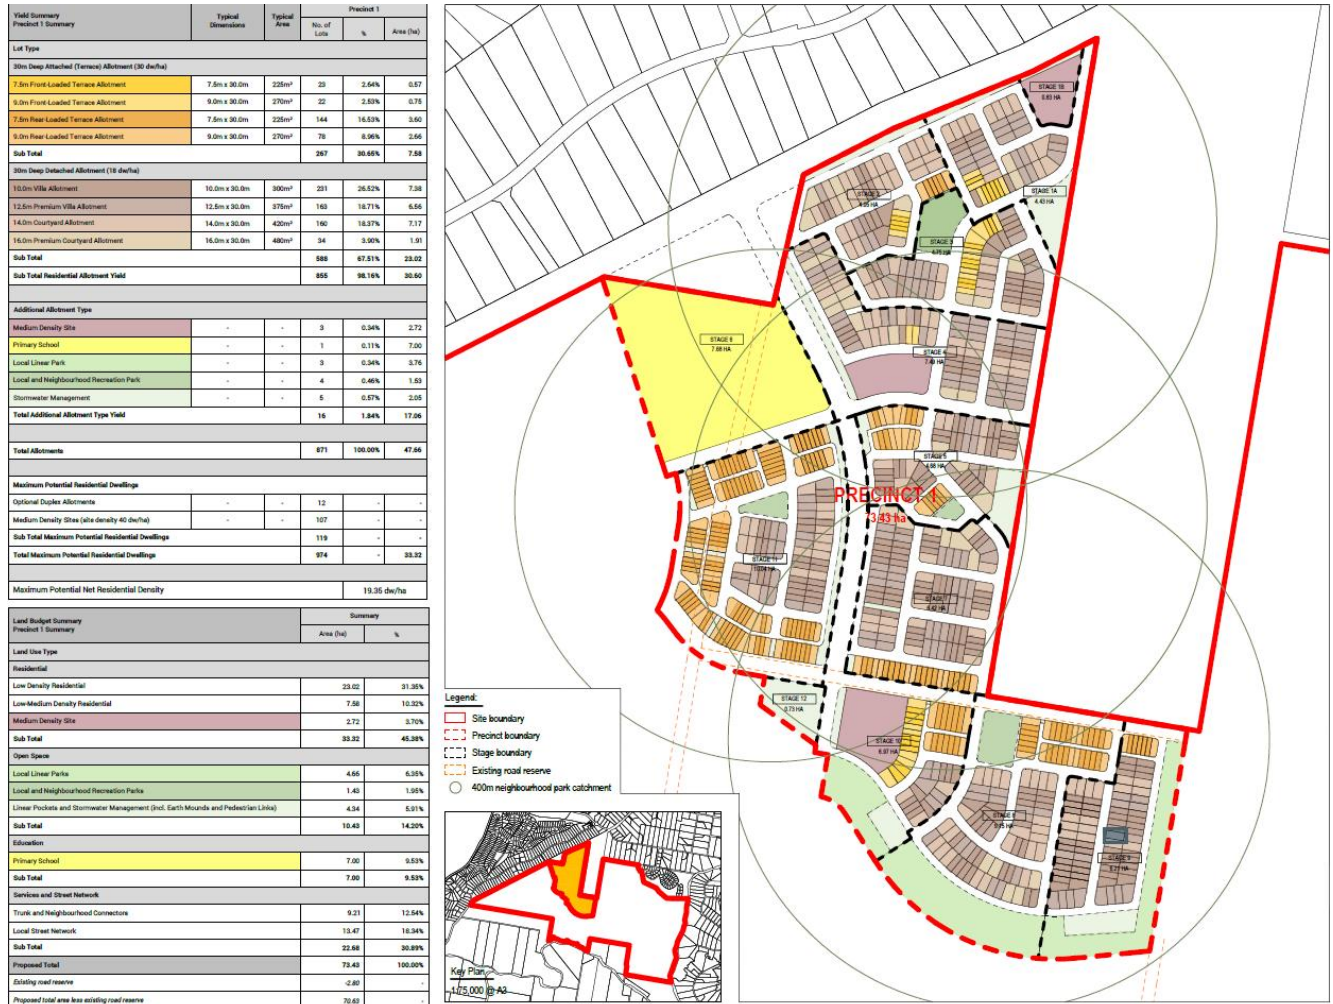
Riverbend Precinct 1 Site Layout (Source: Place Design Group)
